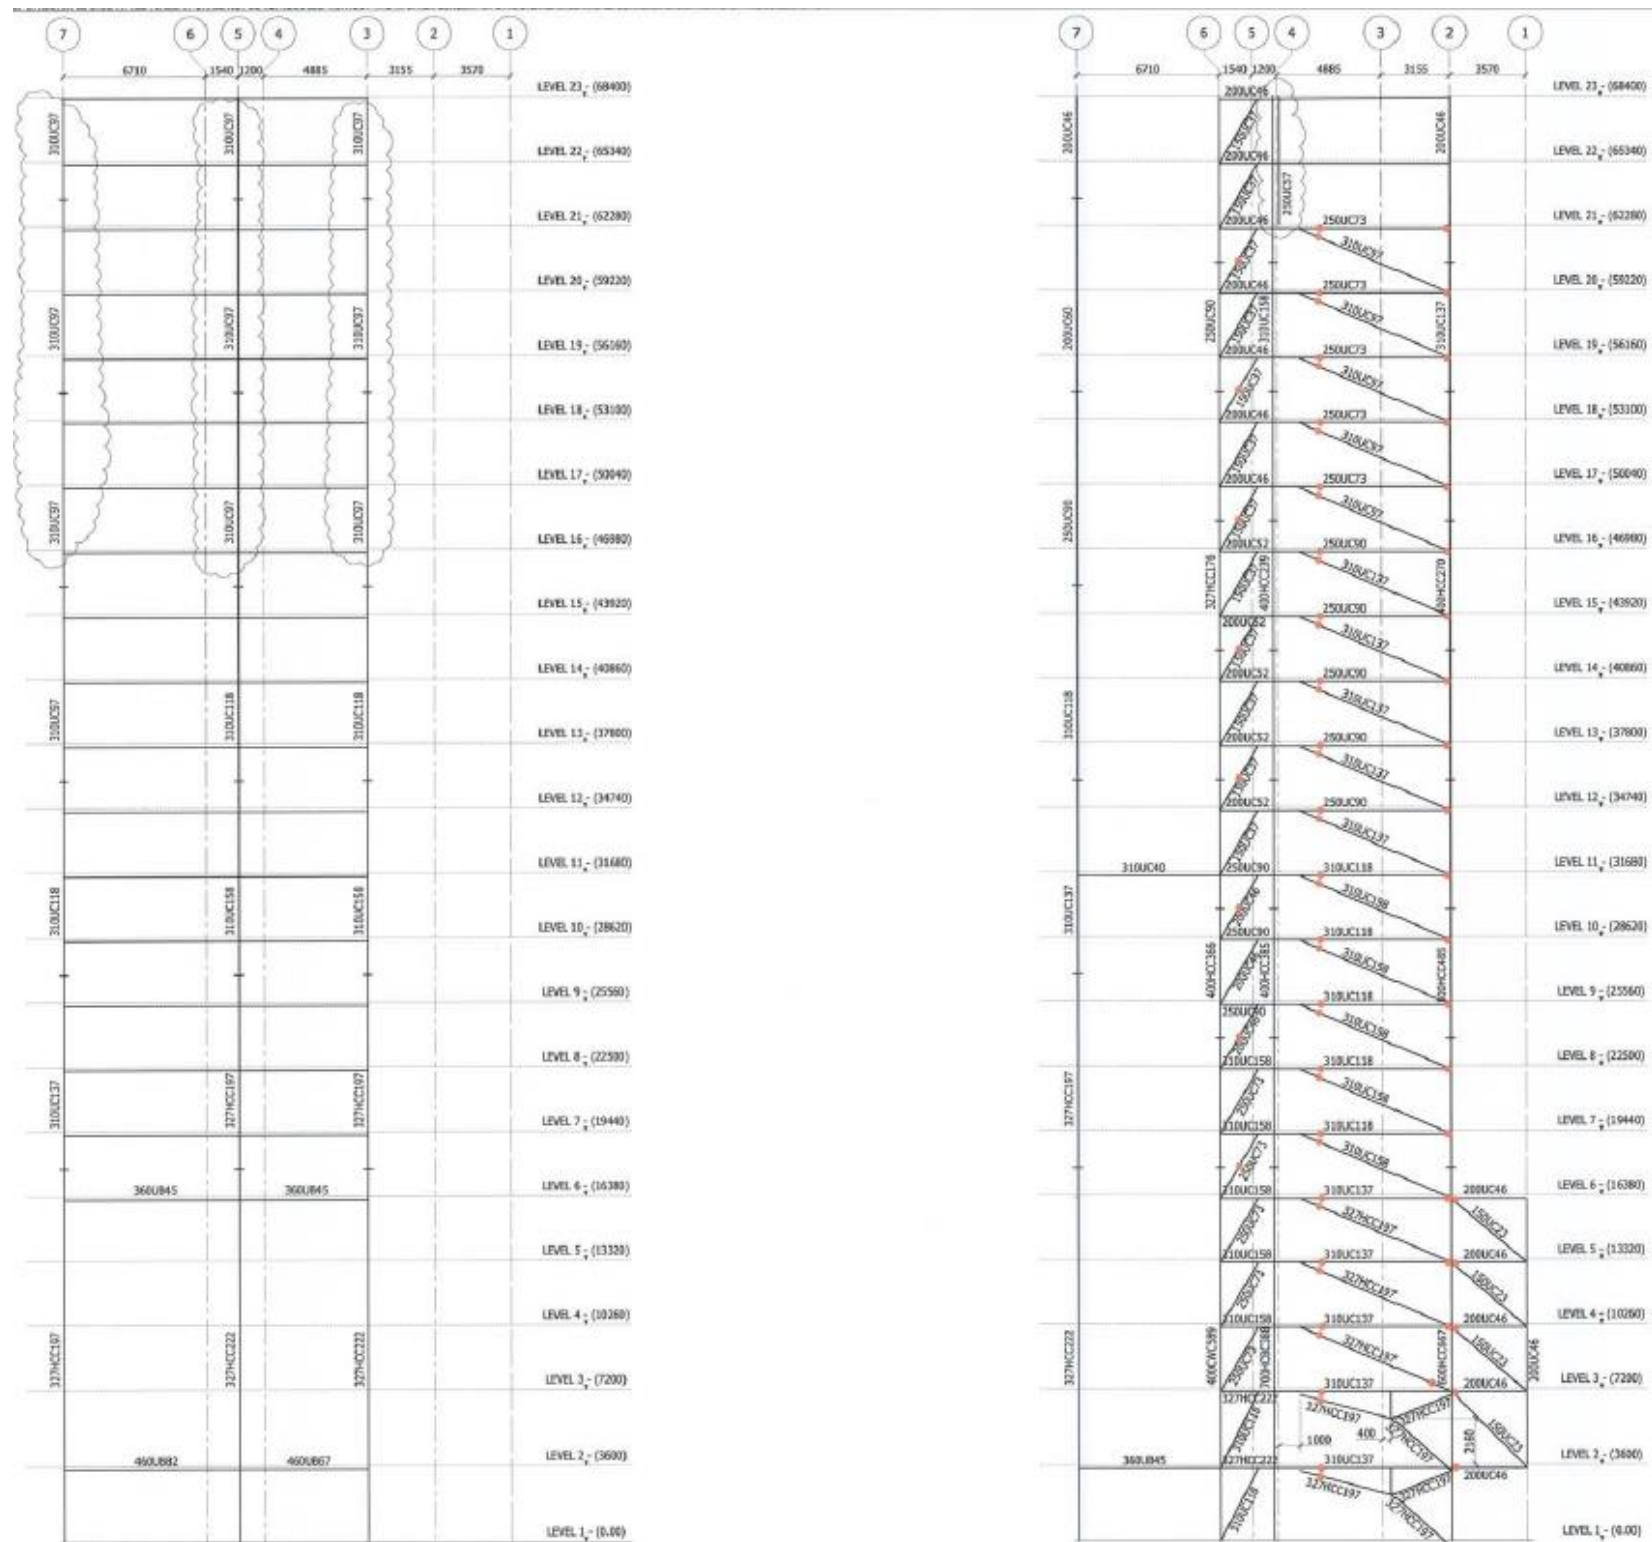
Structural Elevation Grids B and C (Christchurch City Council 2016c)
